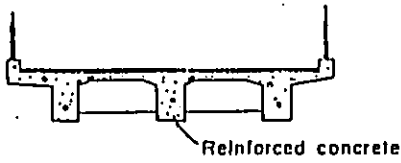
Proposed Structural Plans for Quebrada Areas
